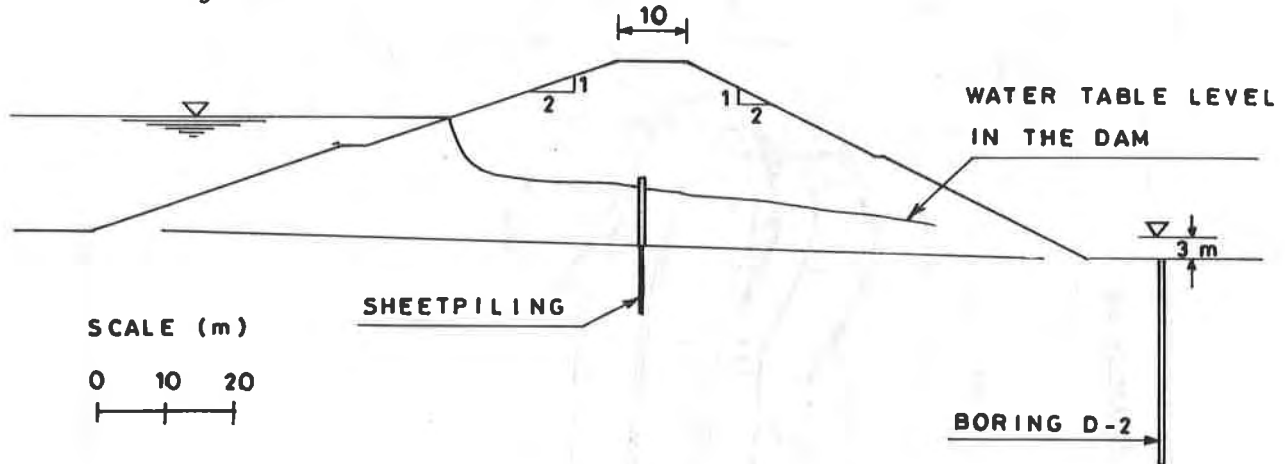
Cross section of Lautaro storage dam. Boring D-2 is shown where pressures up to 3 m water column were measured.
